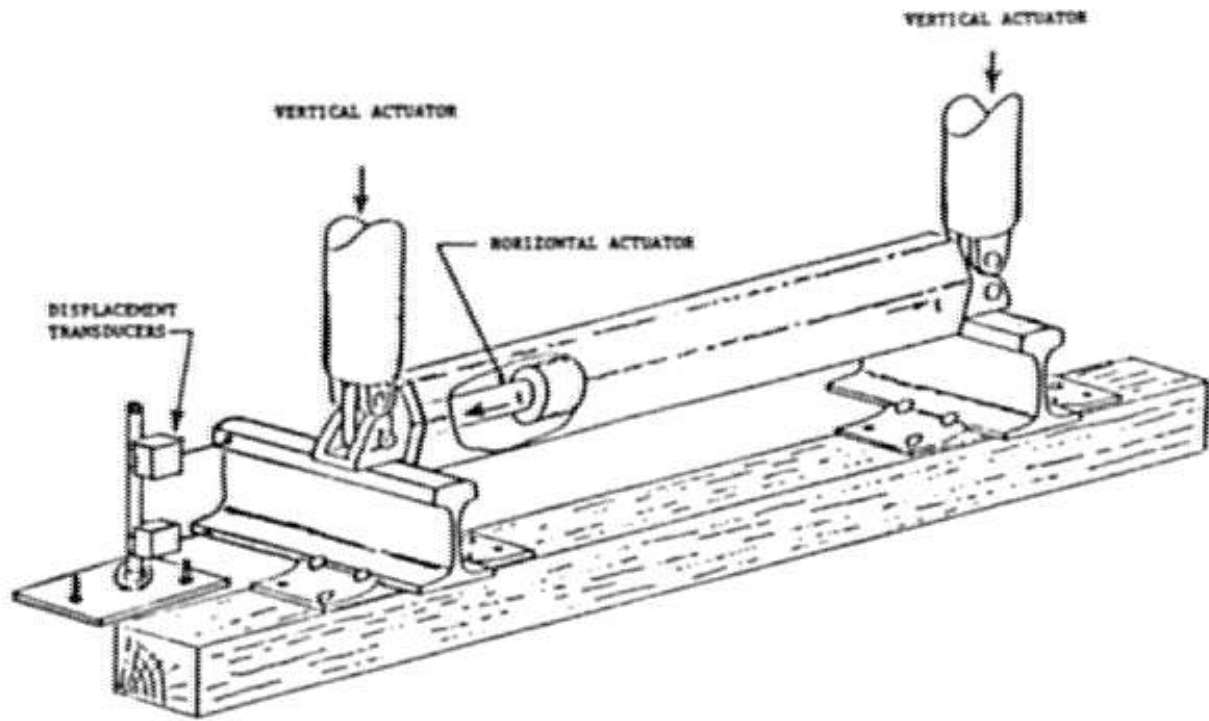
BASIC LAYOUT OF TRACK LOADING FIXTURE
